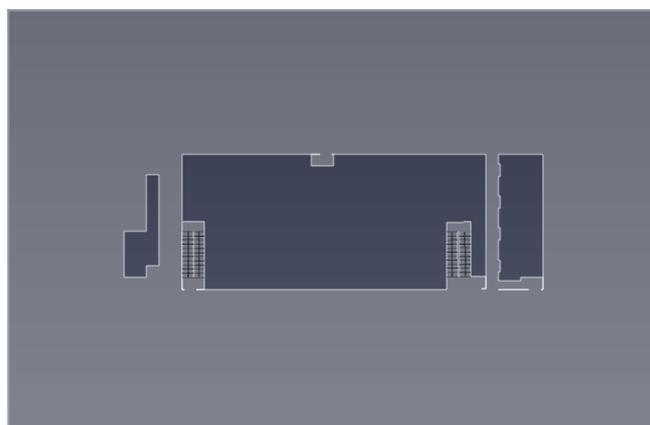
Schematic representation of a typical mid-rise zone floor plan.
